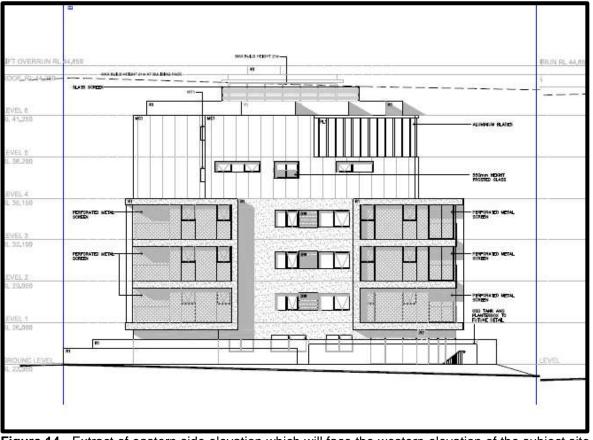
Extract of eastern side elevation which will face the western elevation of the subject site 192-196 Princes Highway, Kogarah Bay. Rooms on level 4 comprise of 2 bedrooms and one living room, level 5 comprises of a screened balcony. (Source: Charles Tang Designs, 2017).
